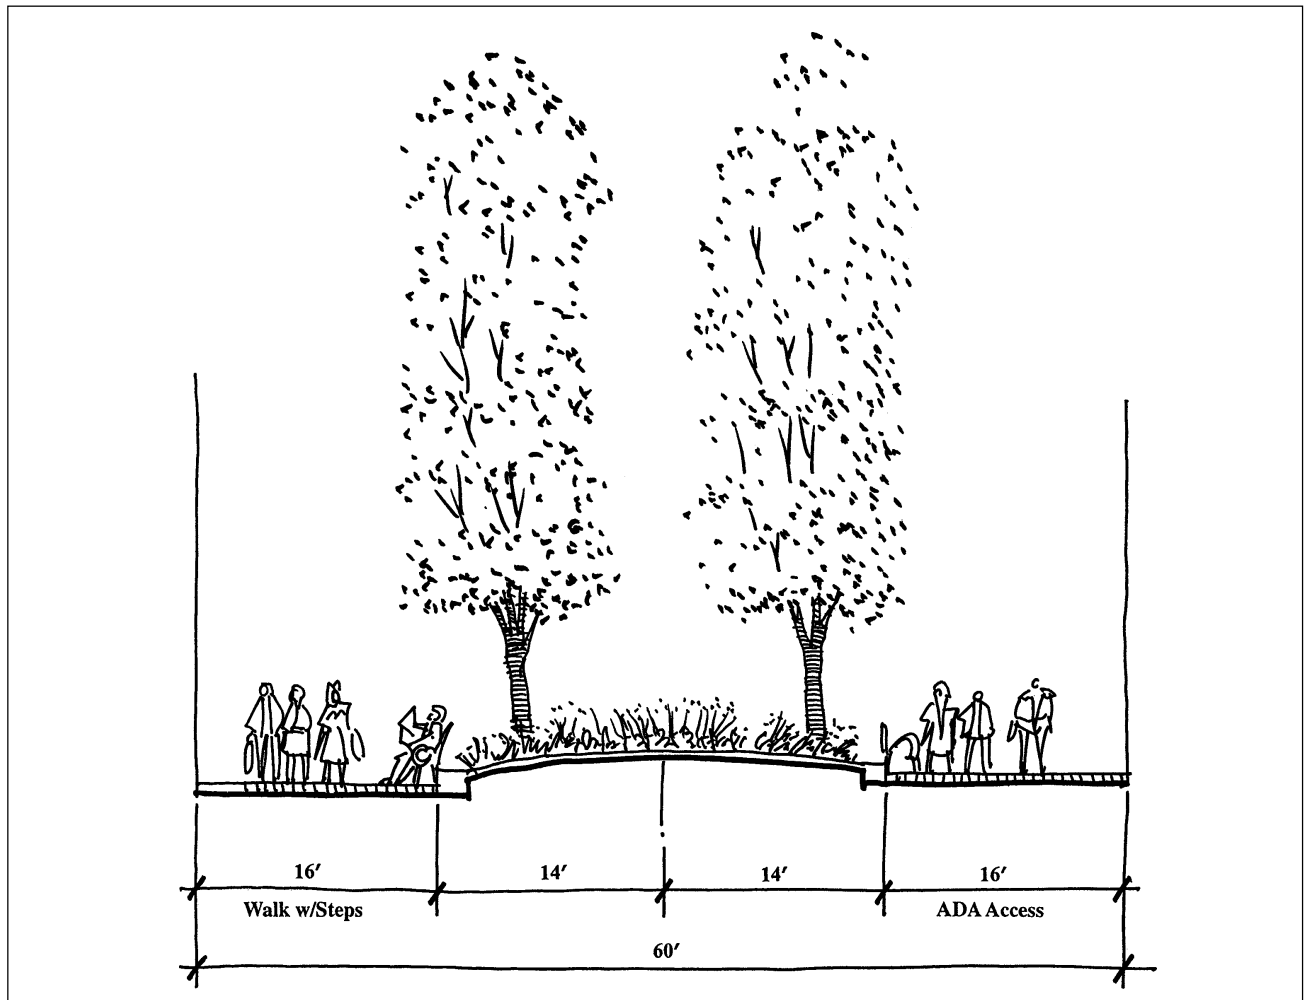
“Garden Hillclimb” Section; Full Boulevard Development – Flowers with Columnar Trees
